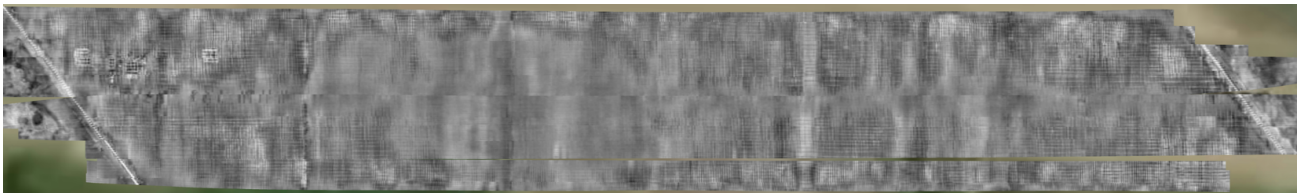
GPR Image Showing Top Steel Condition of Bridge Deck No. 22451
